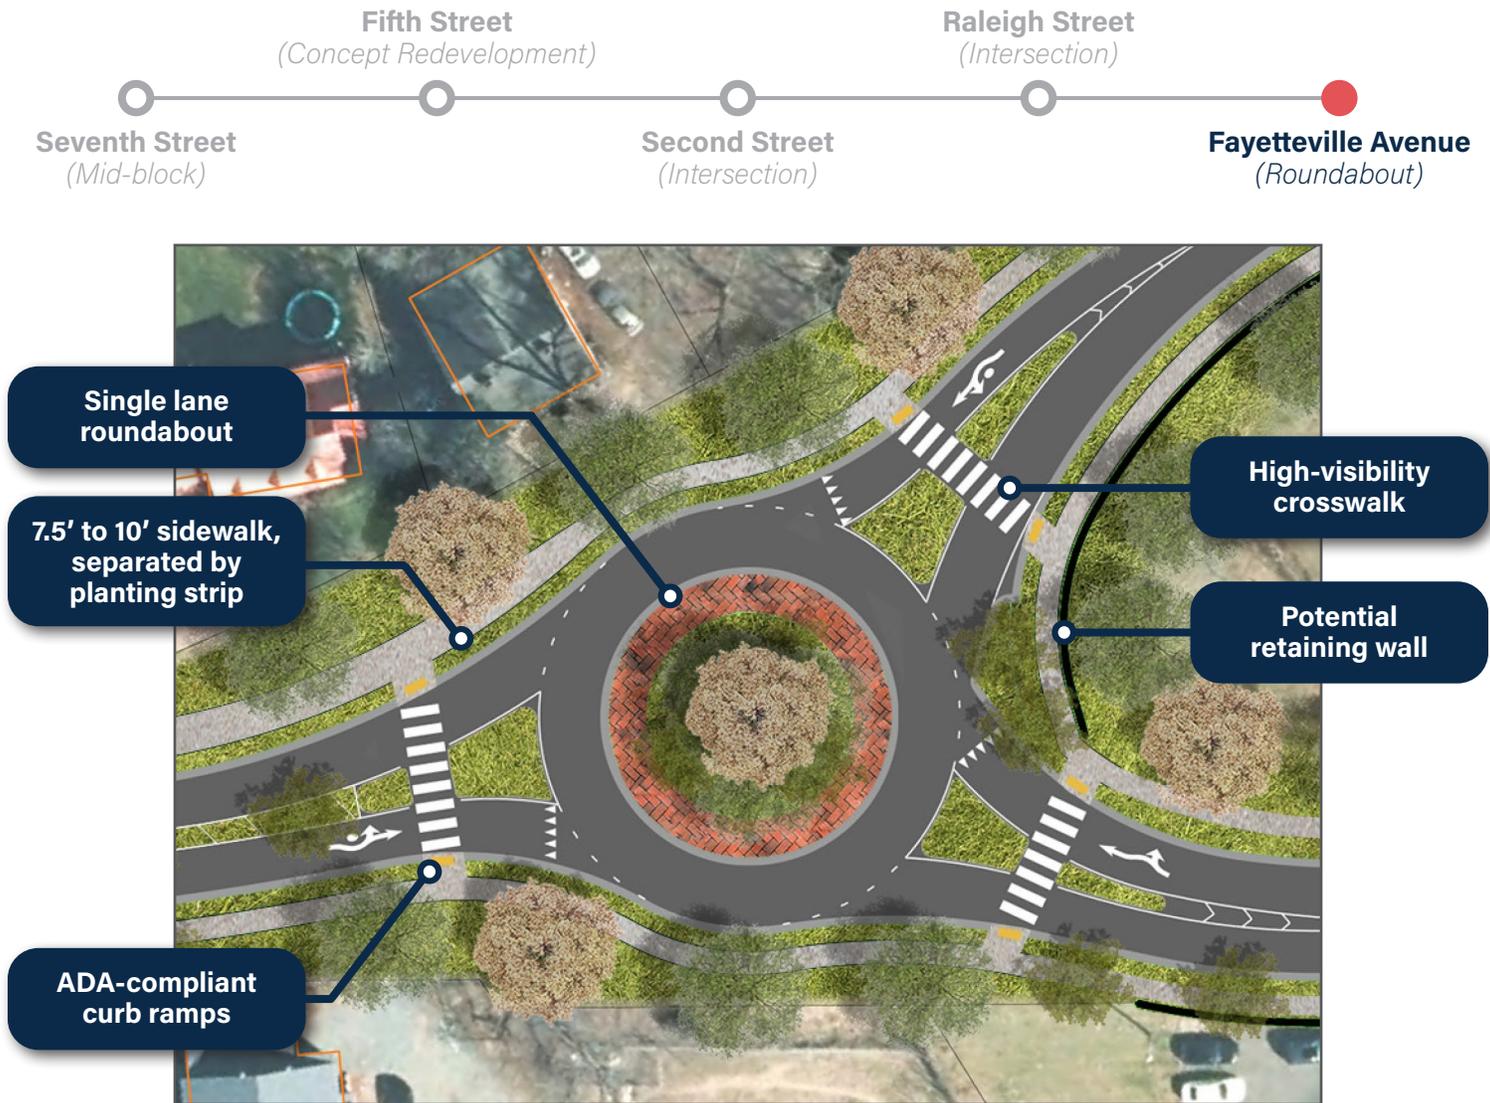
Conceptual design of Fayetteville Avenue roundabout.
